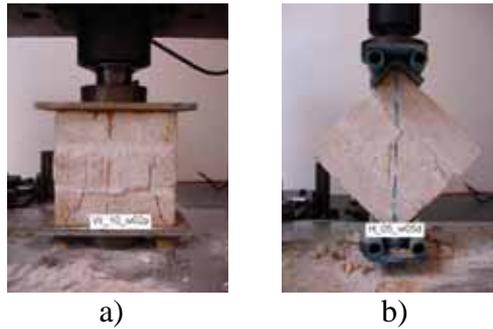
Compression tests on small wallets, a) perpendicular and b) diagonal to the bed joints.
